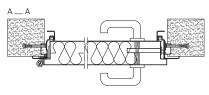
Horizontal cross-section of the ECO Tech external seamless steel door with a corner frame
